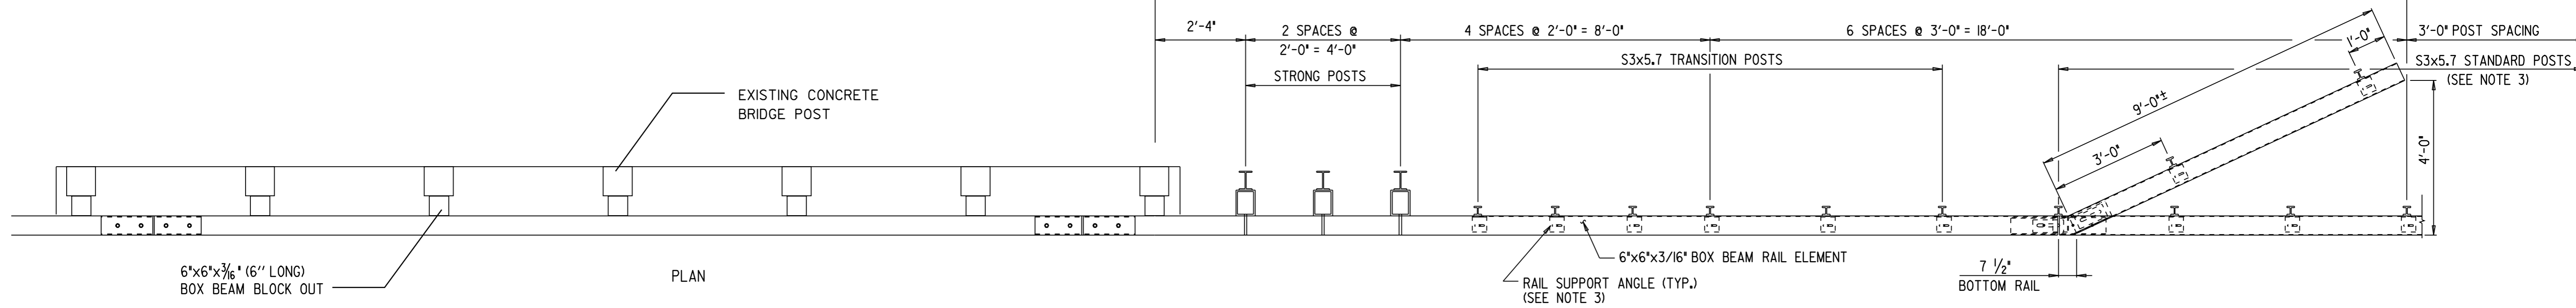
DETAIL FOR ATTACHING BOX BEAM GUARD RAIL TO EXISTING FASCIA MOUNTED POSTS BRIDGE 145
